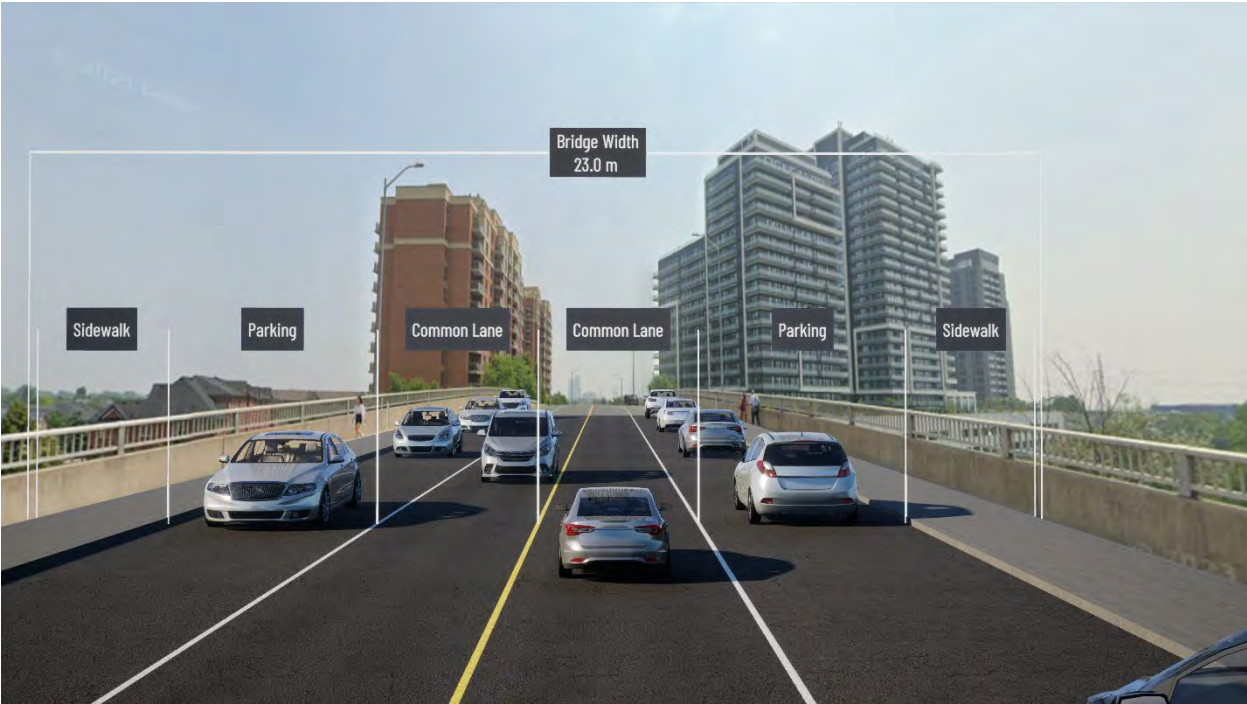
Existing Conditions on Bantry Avenue Bridge between Yonge Street and Maple Road – (Looking east)
